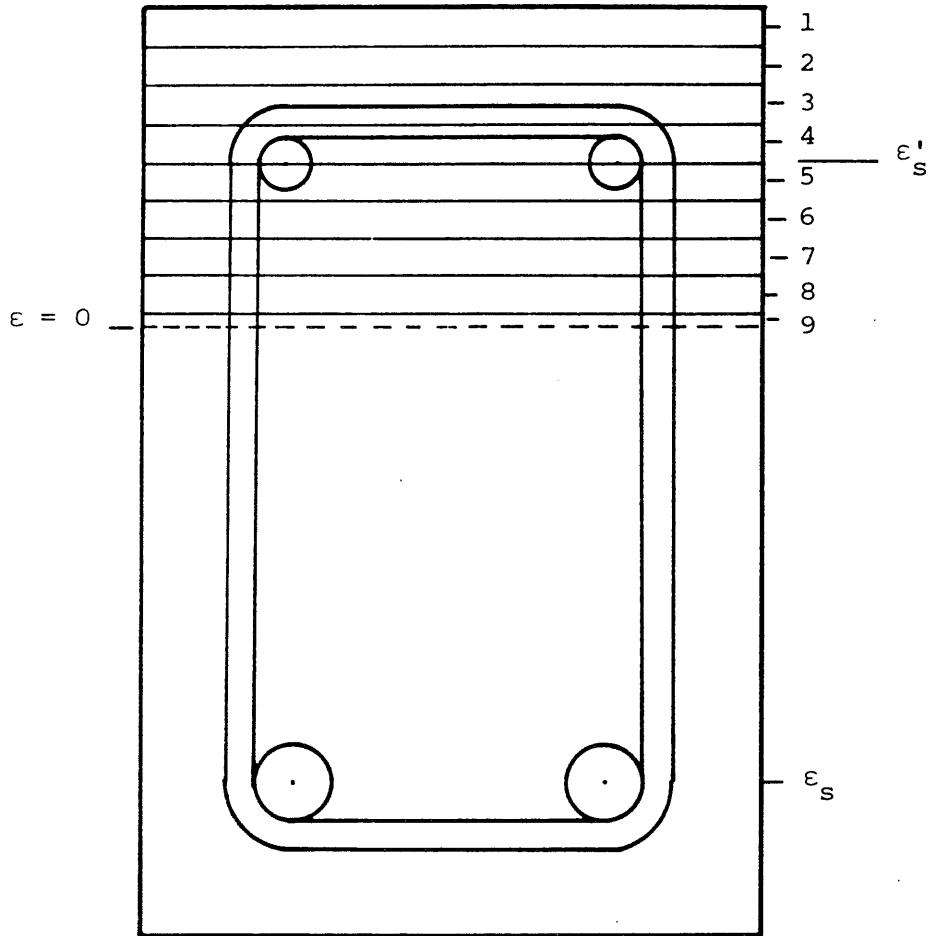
Beam J-2 cross section for Case 3.
